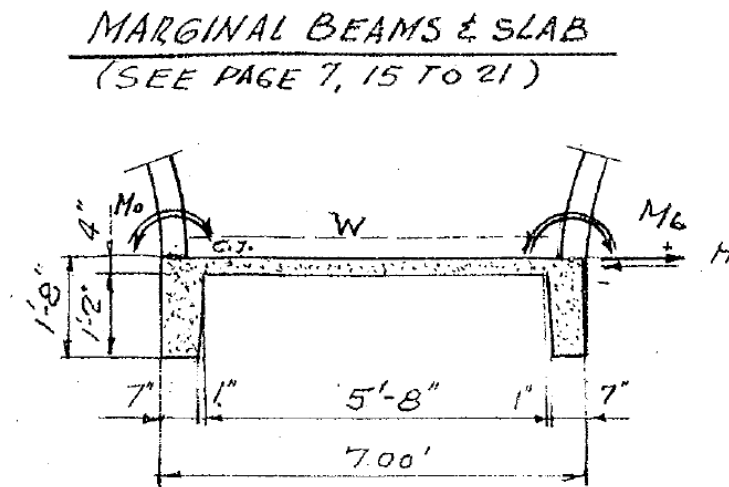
Drawing of a typical edge beam connecting two shells (Komendant, p. 24)
